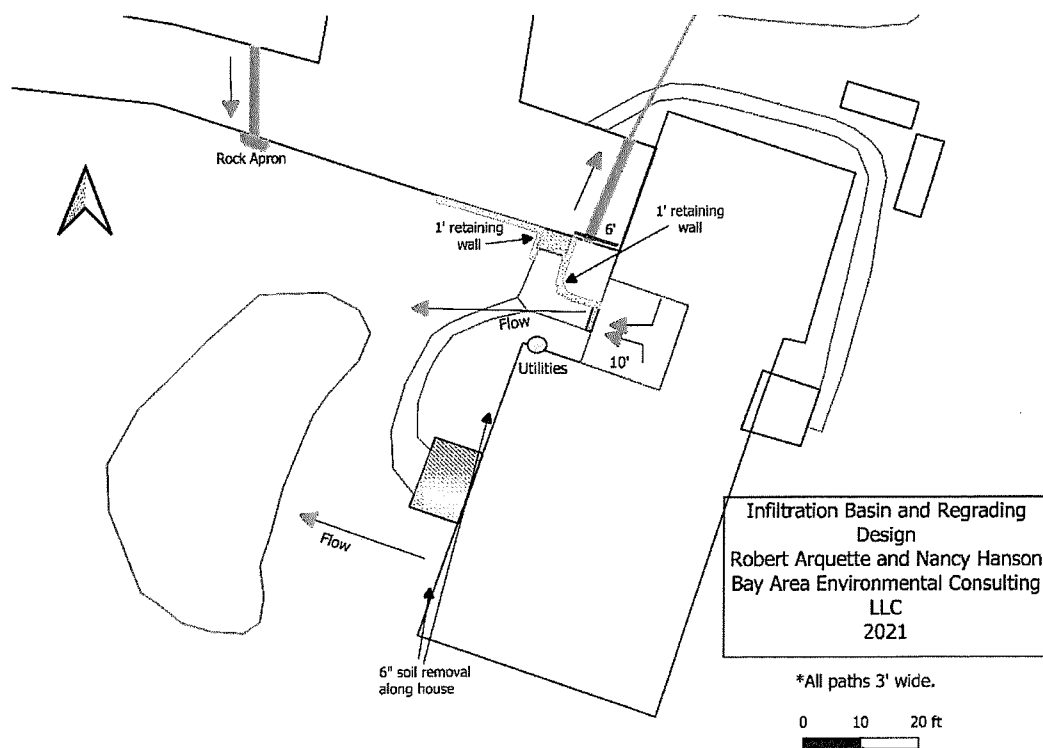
Zoomed in schematics showing more detailed measurements near the breezeway and flow directions of storm water surrounding concerned area of house.
